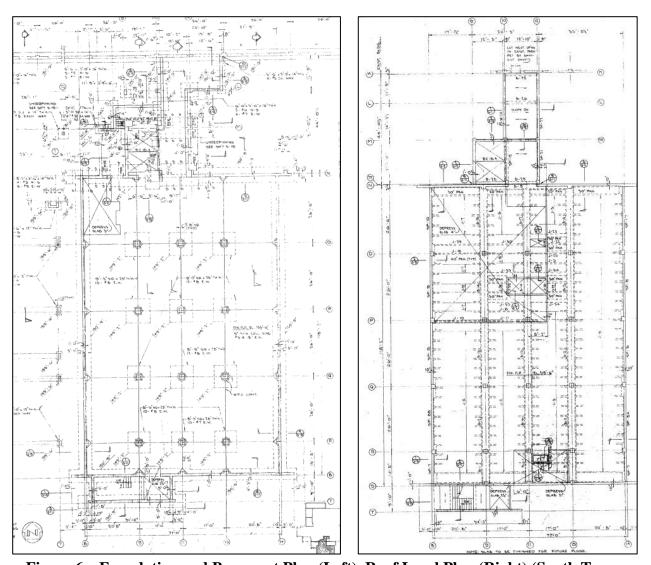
Foundation and Basement Plan (Left), Roof Level Plan (Right) (South Tower and Elevator Tower)
